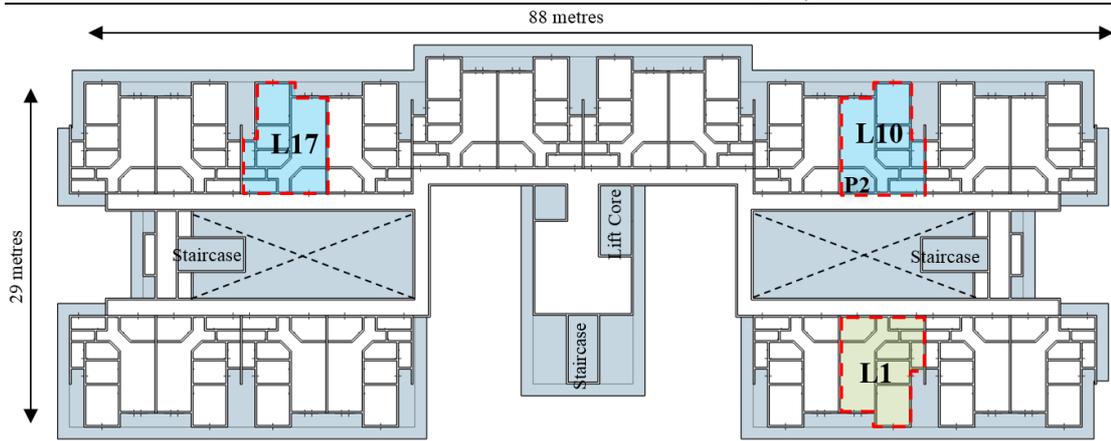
Typical floor plan of PPR Beringin (First Generation)
